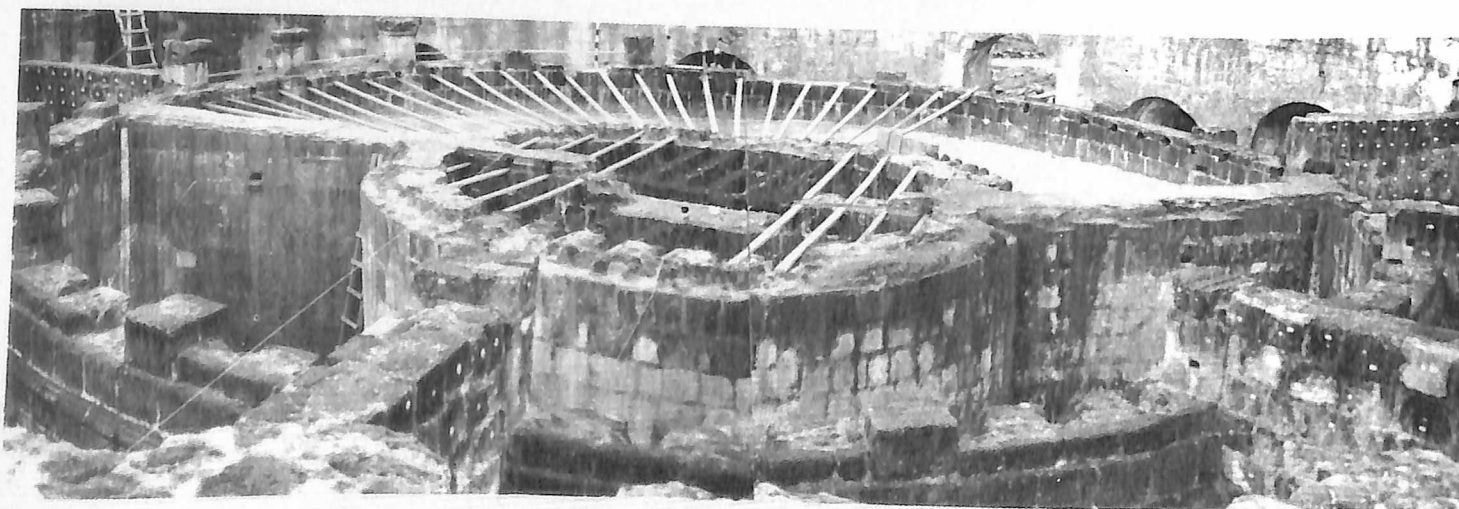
Timber was laid along the timberholes to reconstruct the roofing structure of the second circle. In the first circle, beams were laid out only along the west and east corners of the structure, where an observation platform, consisting of woodboards on top of the beams, was constructed.
